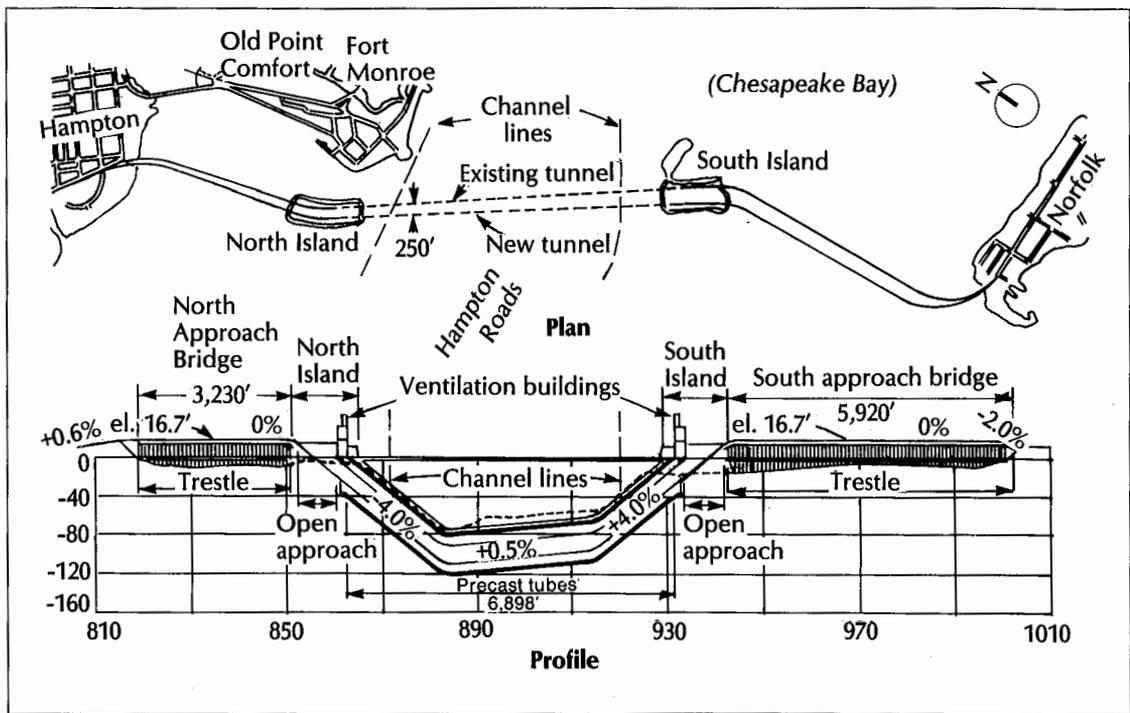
The bridge-tunnel layout for the Hampton Roads project.
